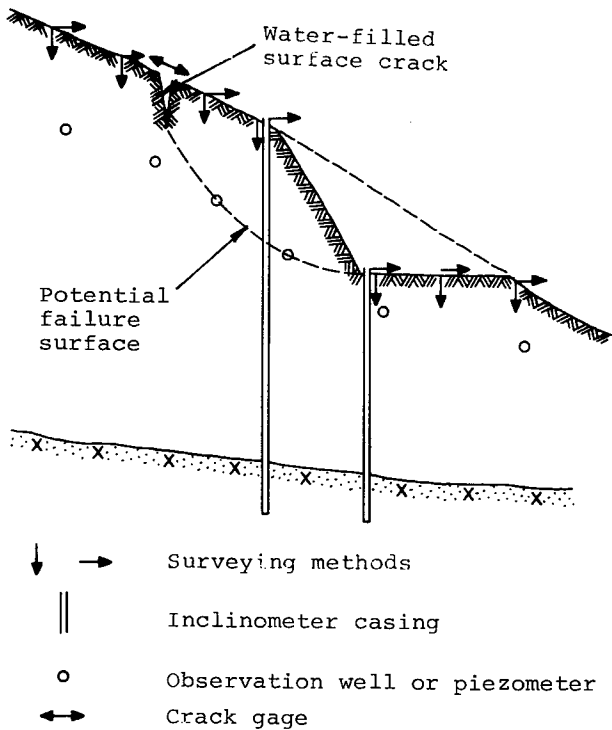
Possible layout of instrumentation for monitoring an excavated slope in soil when there is evidence of instability.⁶
